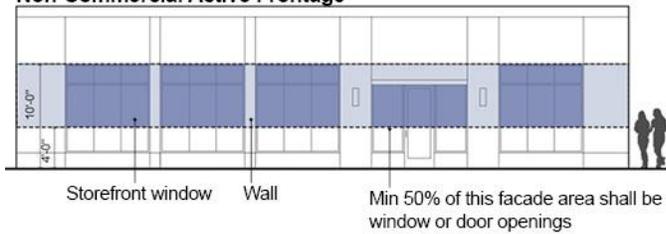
N: GROUND FLOOR WINDOW TRANSPARENCY - MU DISTRICTS
